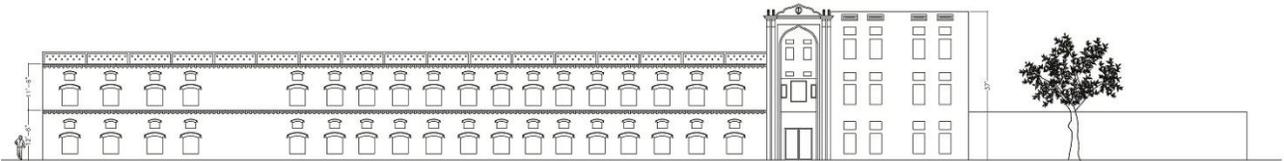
North-West Elevation of the building Complex. (Munir, 2013)
